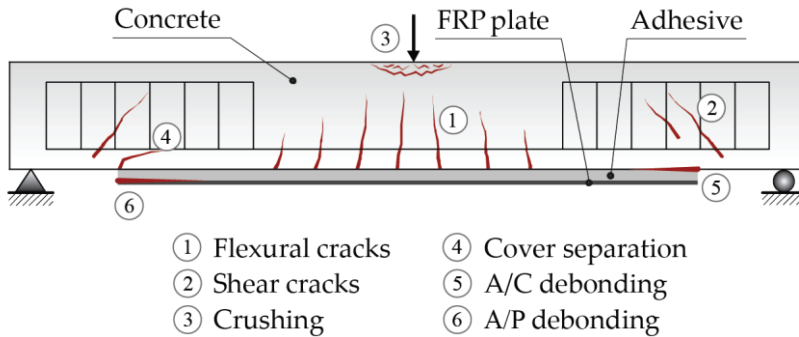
Principal failure mechanisms in internally and/or externally reinforced concrete structures.
